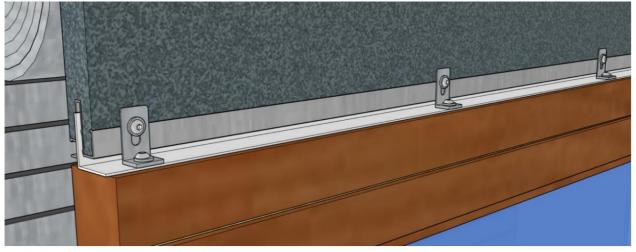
Angle and connecting bracket with the frame for reinforced box
